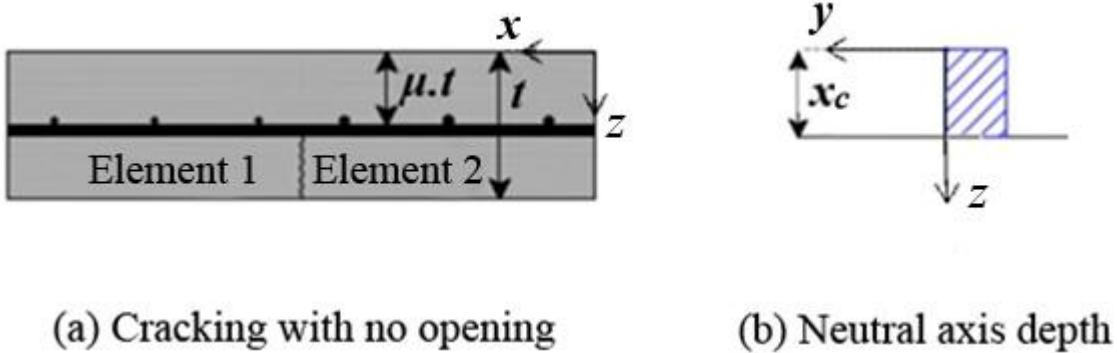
(a) slab cracking before opening; (b) compression stress block (Mangeon 2013)
